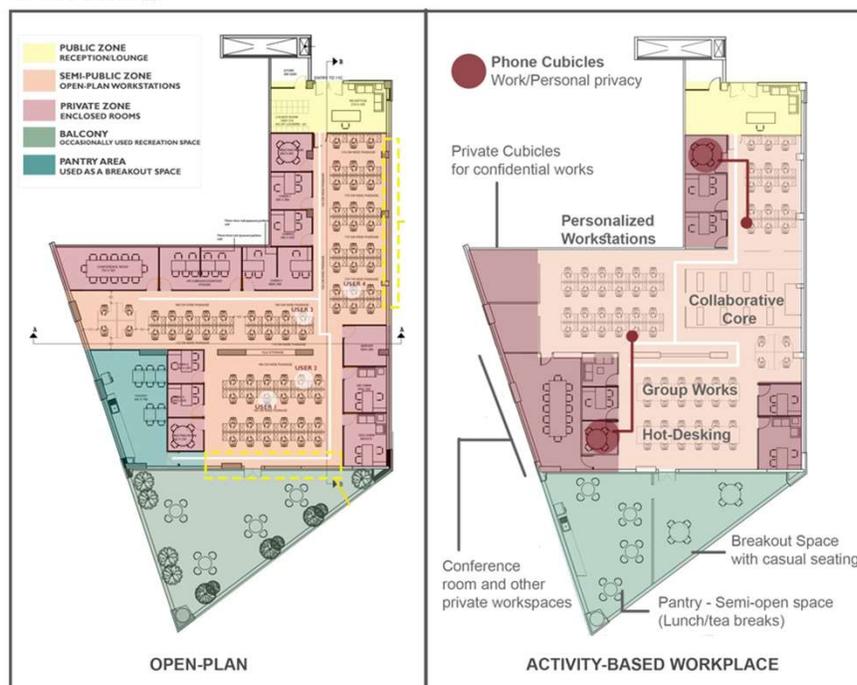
(a) Open-plan layout –Existing (b) ABW planning- Modified spatial configuration;
